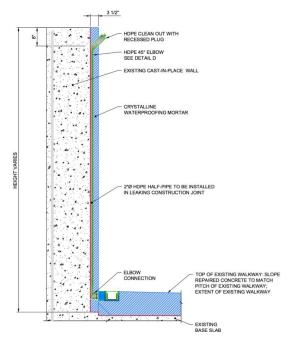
Cross Section of Vertical CIP Wall Construction Joint Repair
